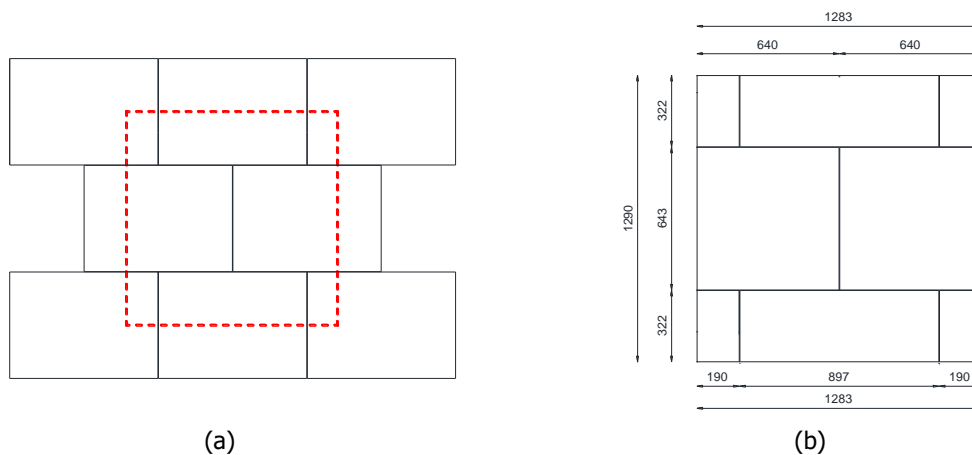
Compression test on CS element masonry specimen: (a) tested portion; (b) dimensions of the specimen (in mm).
